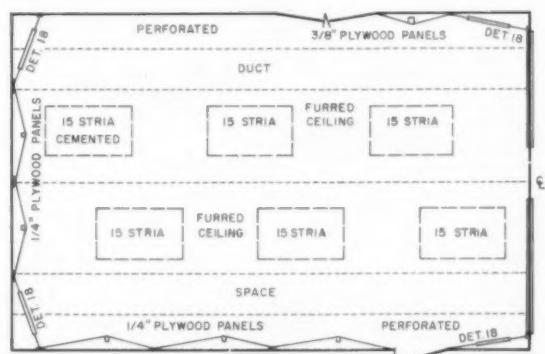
Band Studio. Solid lines give plan view. Dotted lines give reflected ceiling plan.
